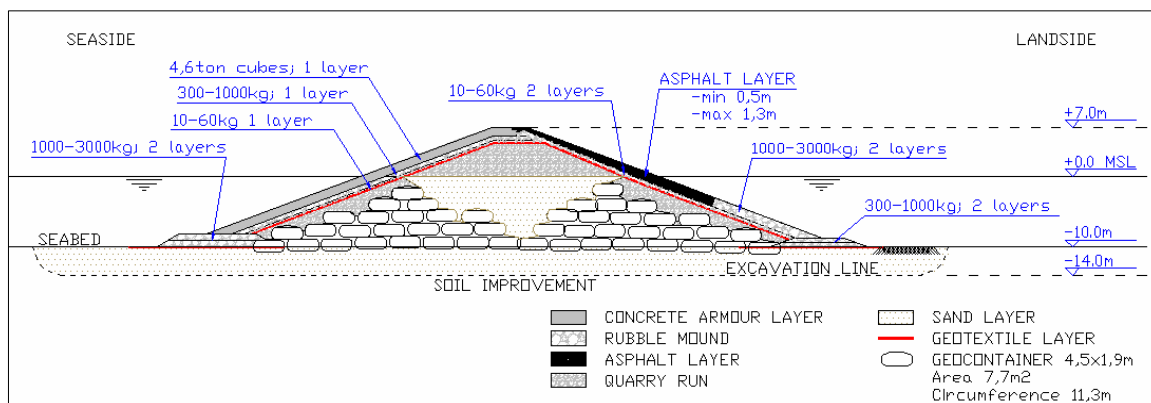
Cross section Offshore Tsunami Barrier; composition
